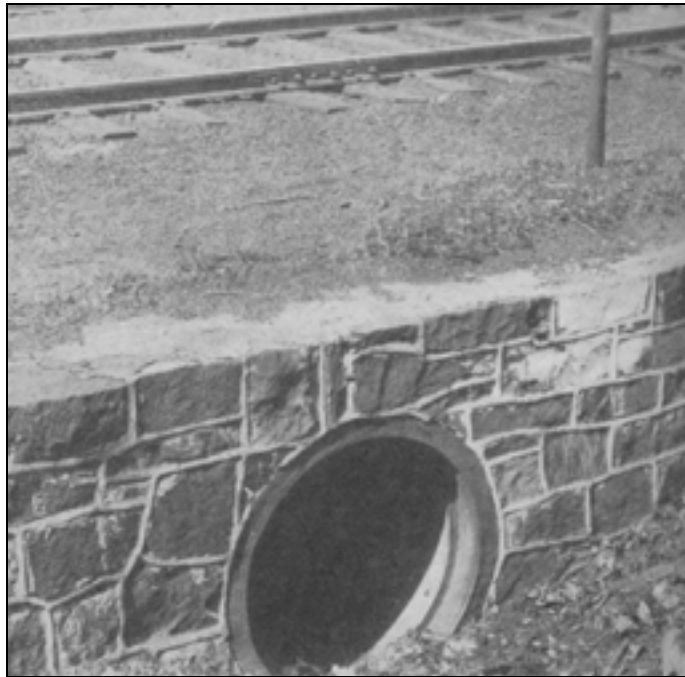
Cast-iron and masonry pipe culvert (Howson 1926:448)
